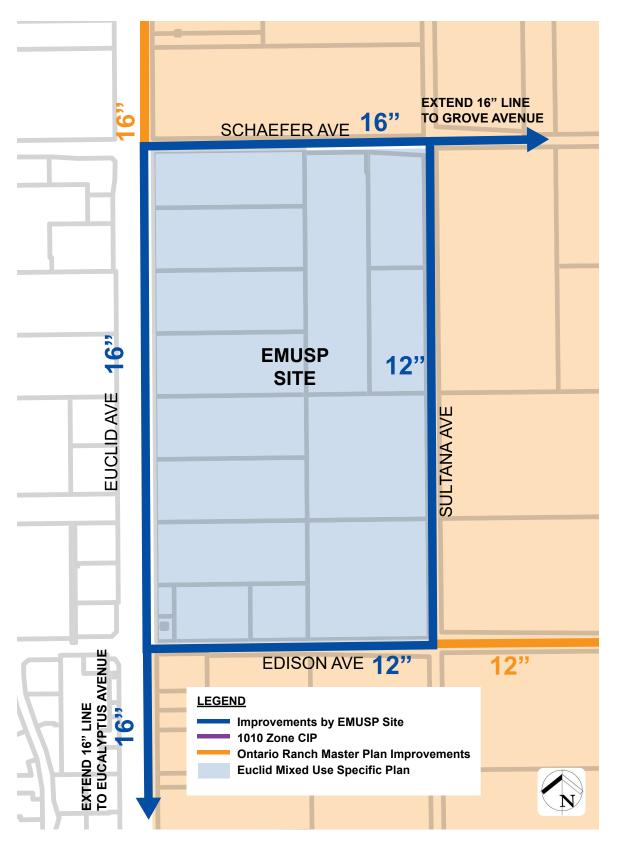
SPECIFIC PLAN DOMESTIC WATER PLAN
